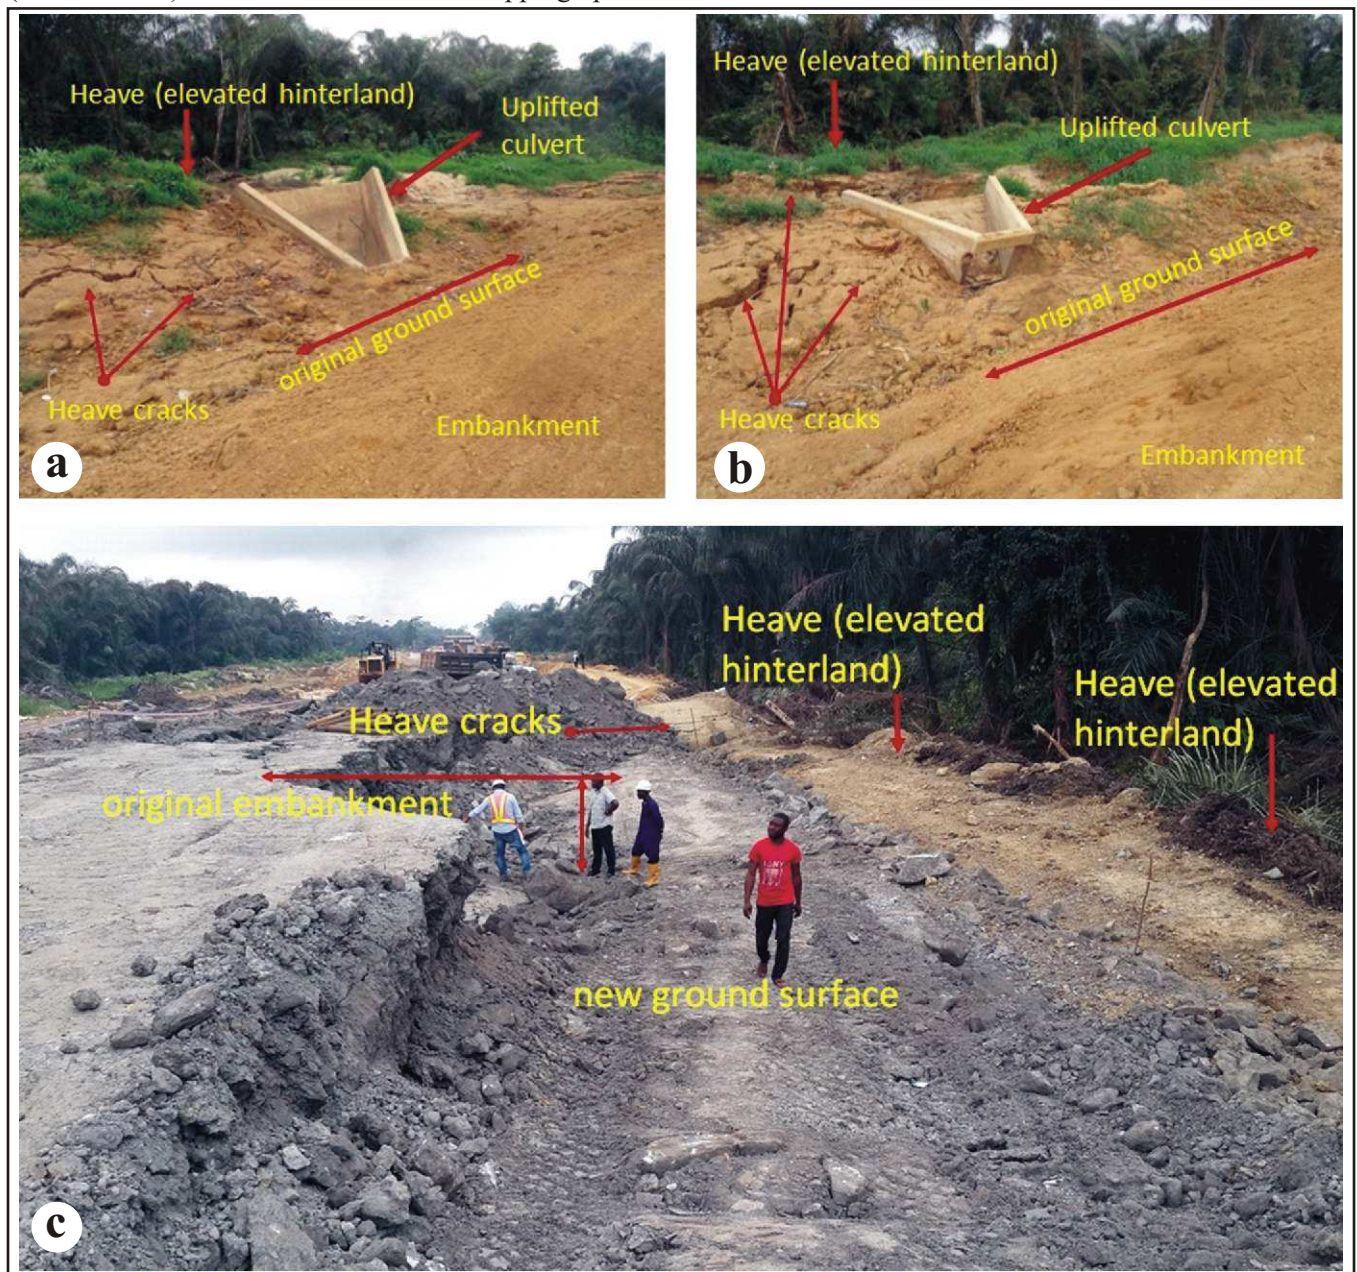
(a, b) Differential settlements and failure of a road culvert at a section of the highway alignment. (c) Shear-failure of the soft soil foundation due to overburden (fill) pressure
